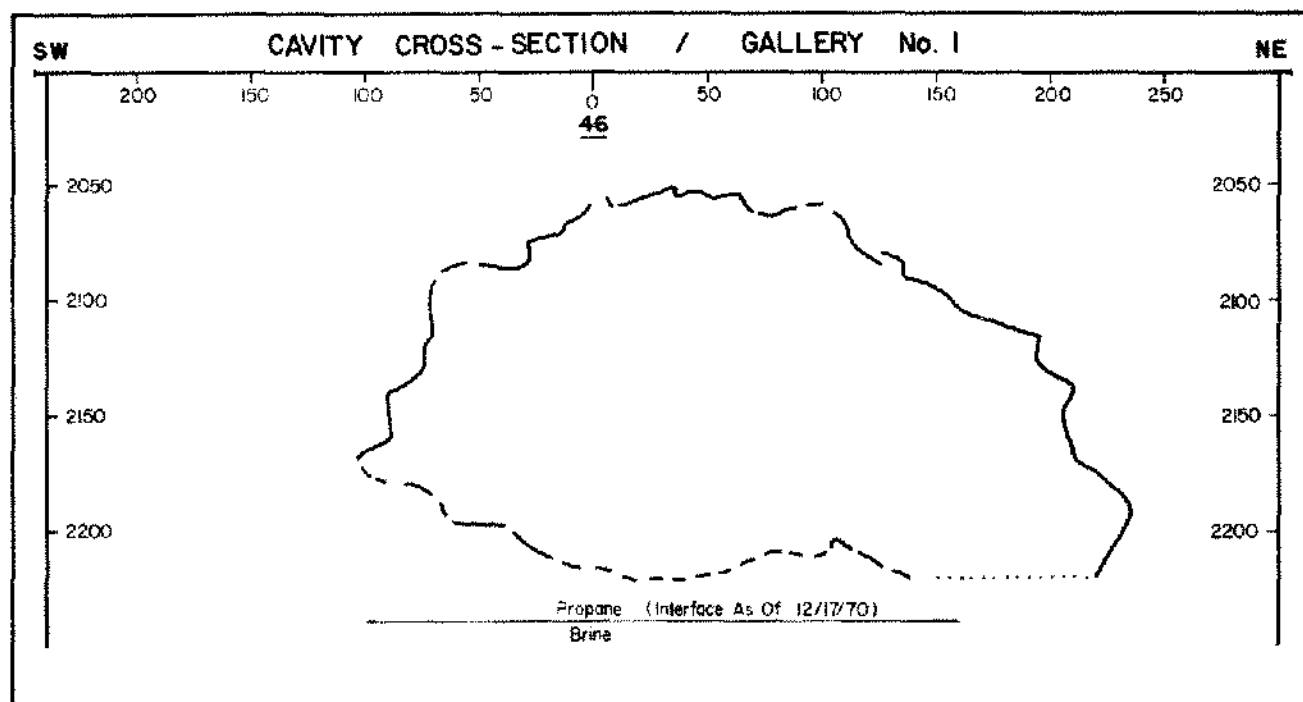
Cross section of the salt storage cavity through Gallery No. 1 (SW-NE).
